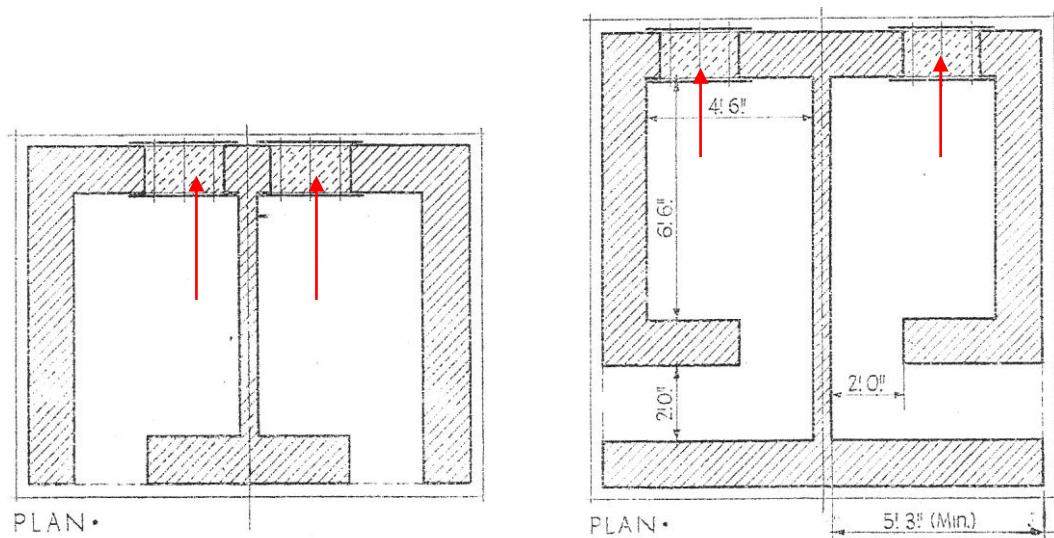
Plan views of double shelters demonstrating alternative entrances.
